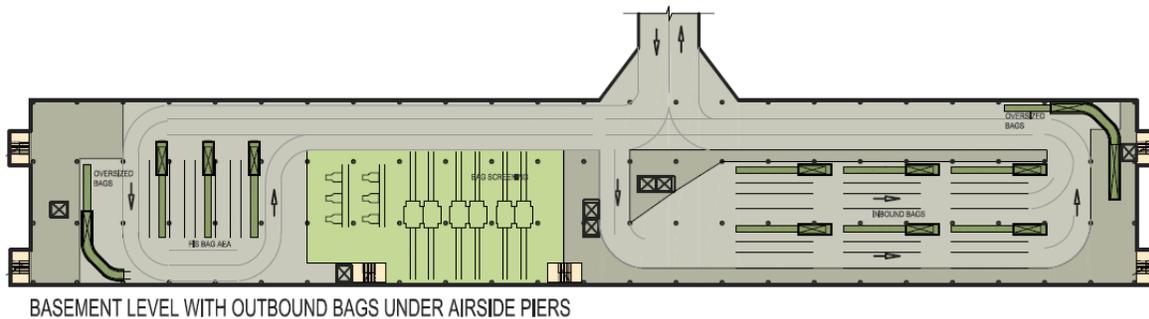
Architect suggested layout, basement level BHS at North Terminal
